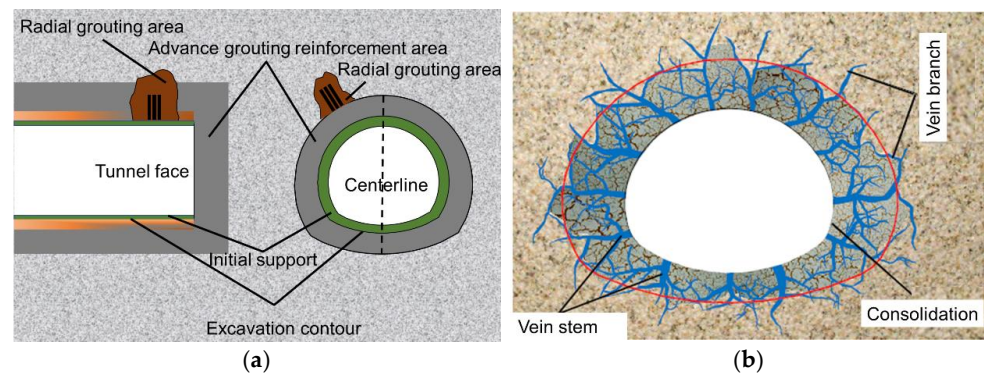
Comparison of grouting methods [103,108]. (a) Single full section crack grouting; (b) new concept of compound grouting.
